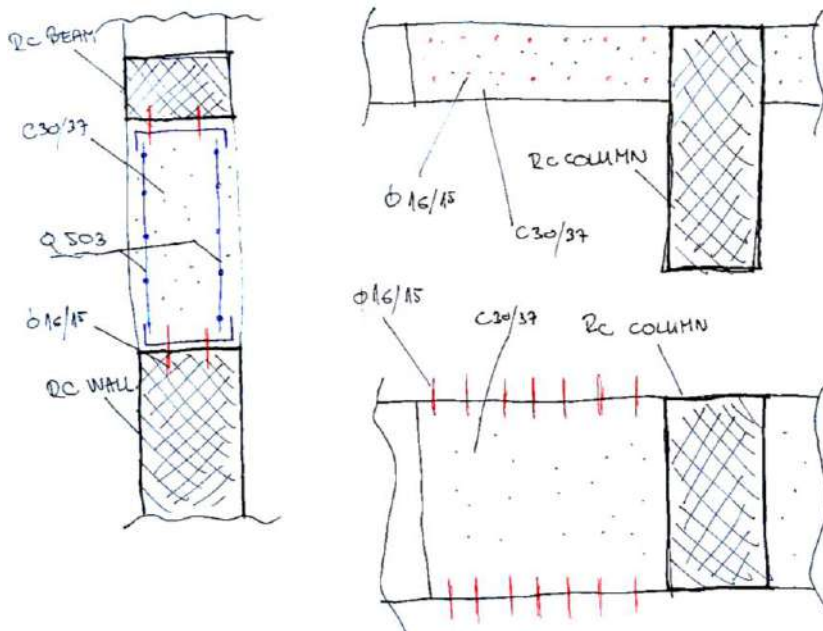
reinforcement sketches (clockwise from the left: section, floorplan, elevation)
